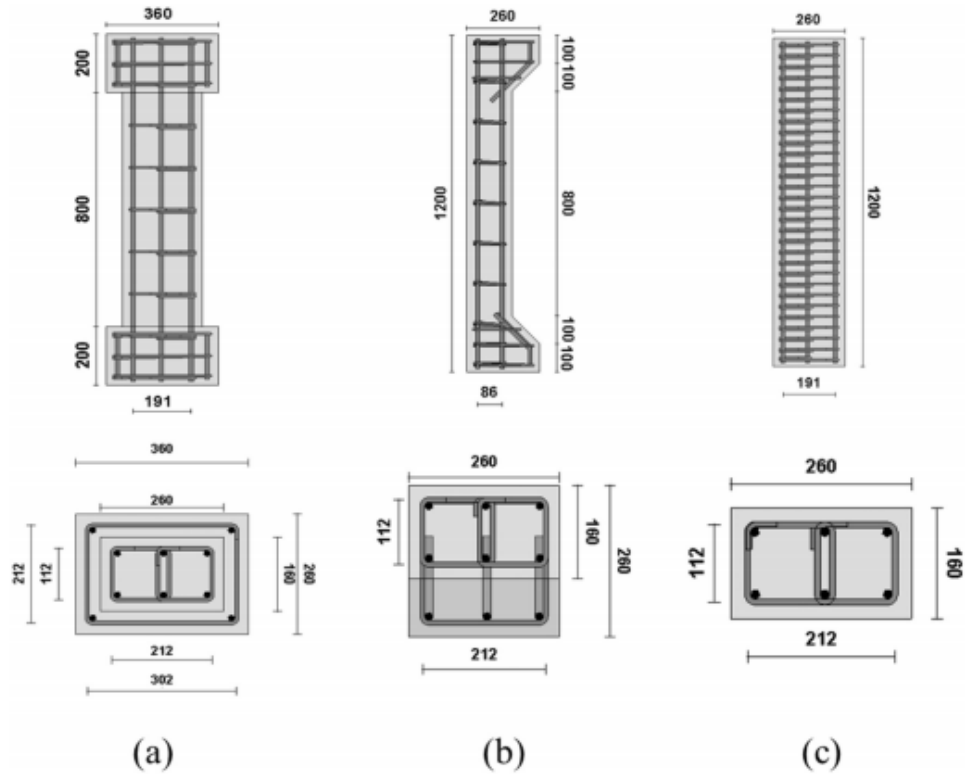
Sketch of RC columns by Elchalakani, (a) concentrically loaded column, (b) eccentrically loaded column, (c) beam. (in mm) [50].
